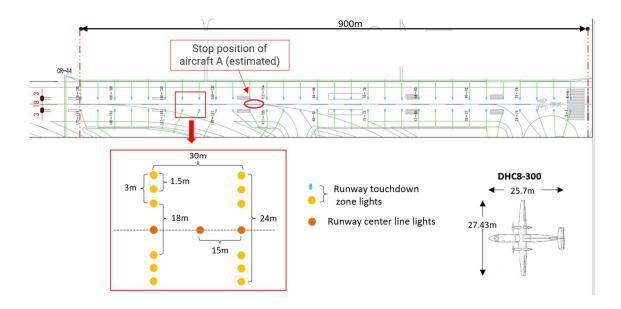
Location of Runway Touchdown Zone Lights and Runway Centerline Lights
